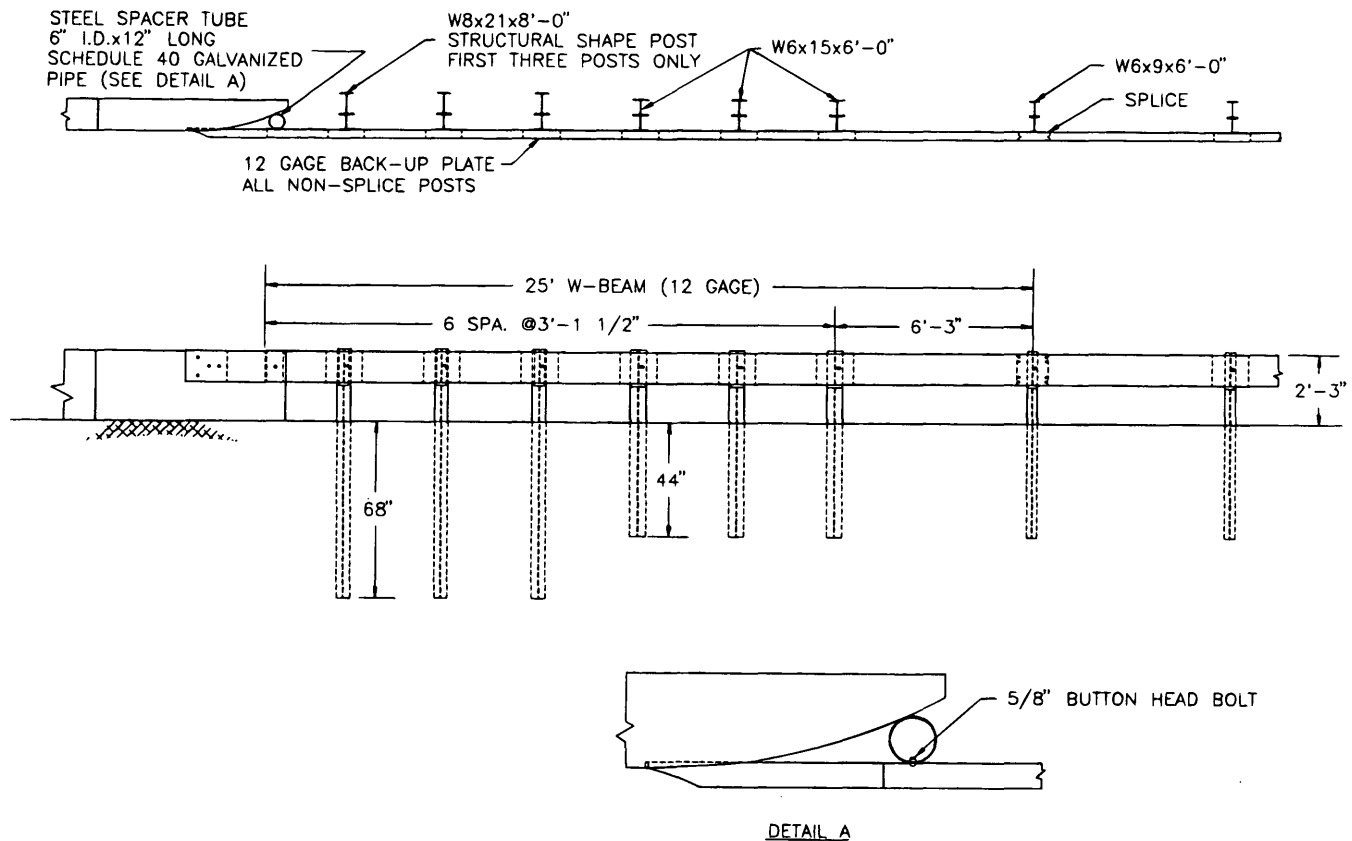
Modified steel post transition to vertical concrete parapet—larger post size and embedment depth option.
